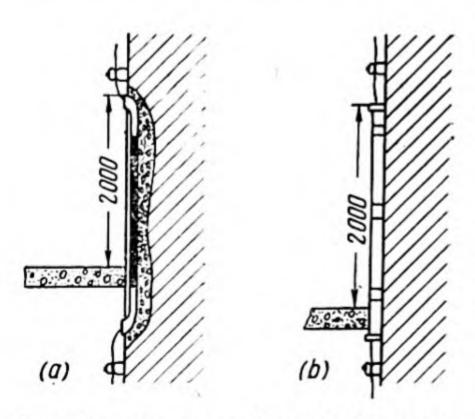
Passages through betweenstorey floor structures for wiring with grade ΠP (PR) rubber-covered wire installed on knob insulators: a—concealed passage in insulating tubing, b—concealed in steel conduit pipe.
